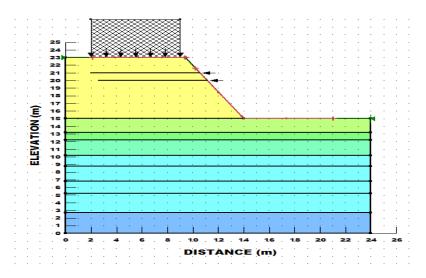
Surcharge load on sloped soil embankment for recommended set F (Table 2) subject to the seismic loading
